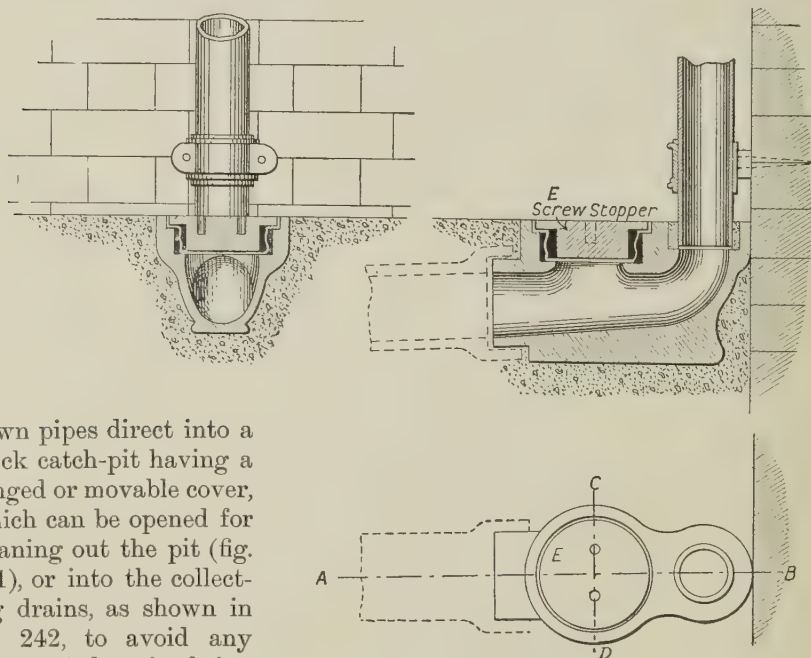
Rainwater Shoes. Plan and Sections AB and CD
